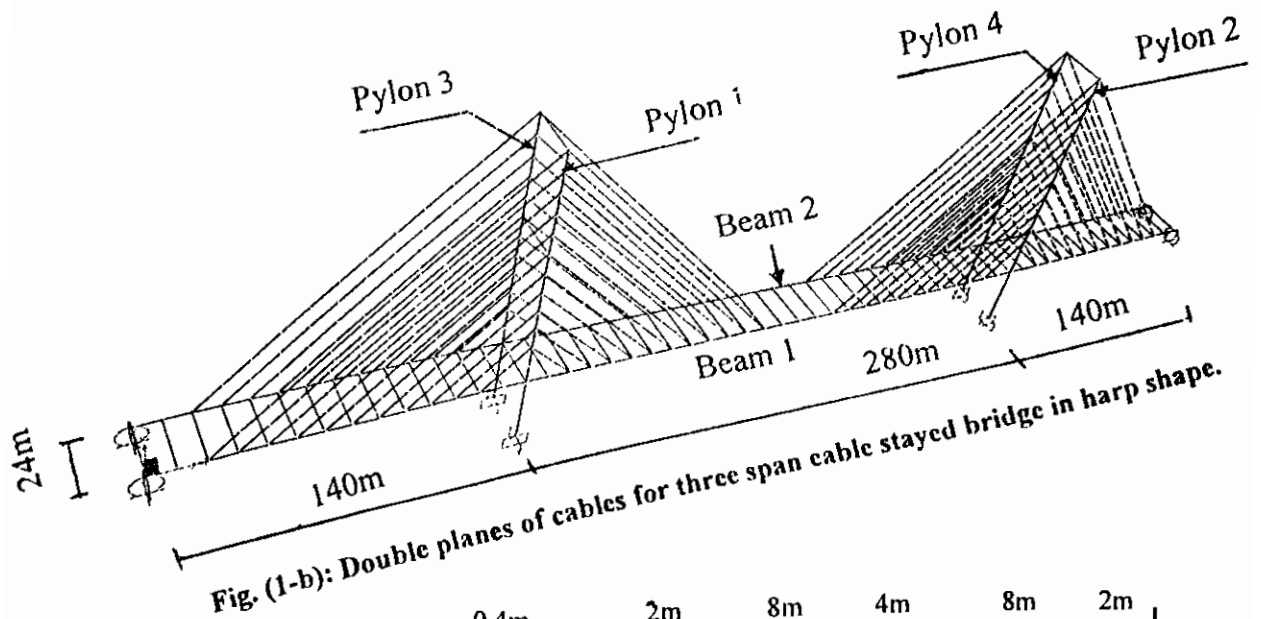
b): Double planes of cables for three span cable stayed bridge in harp shape.
